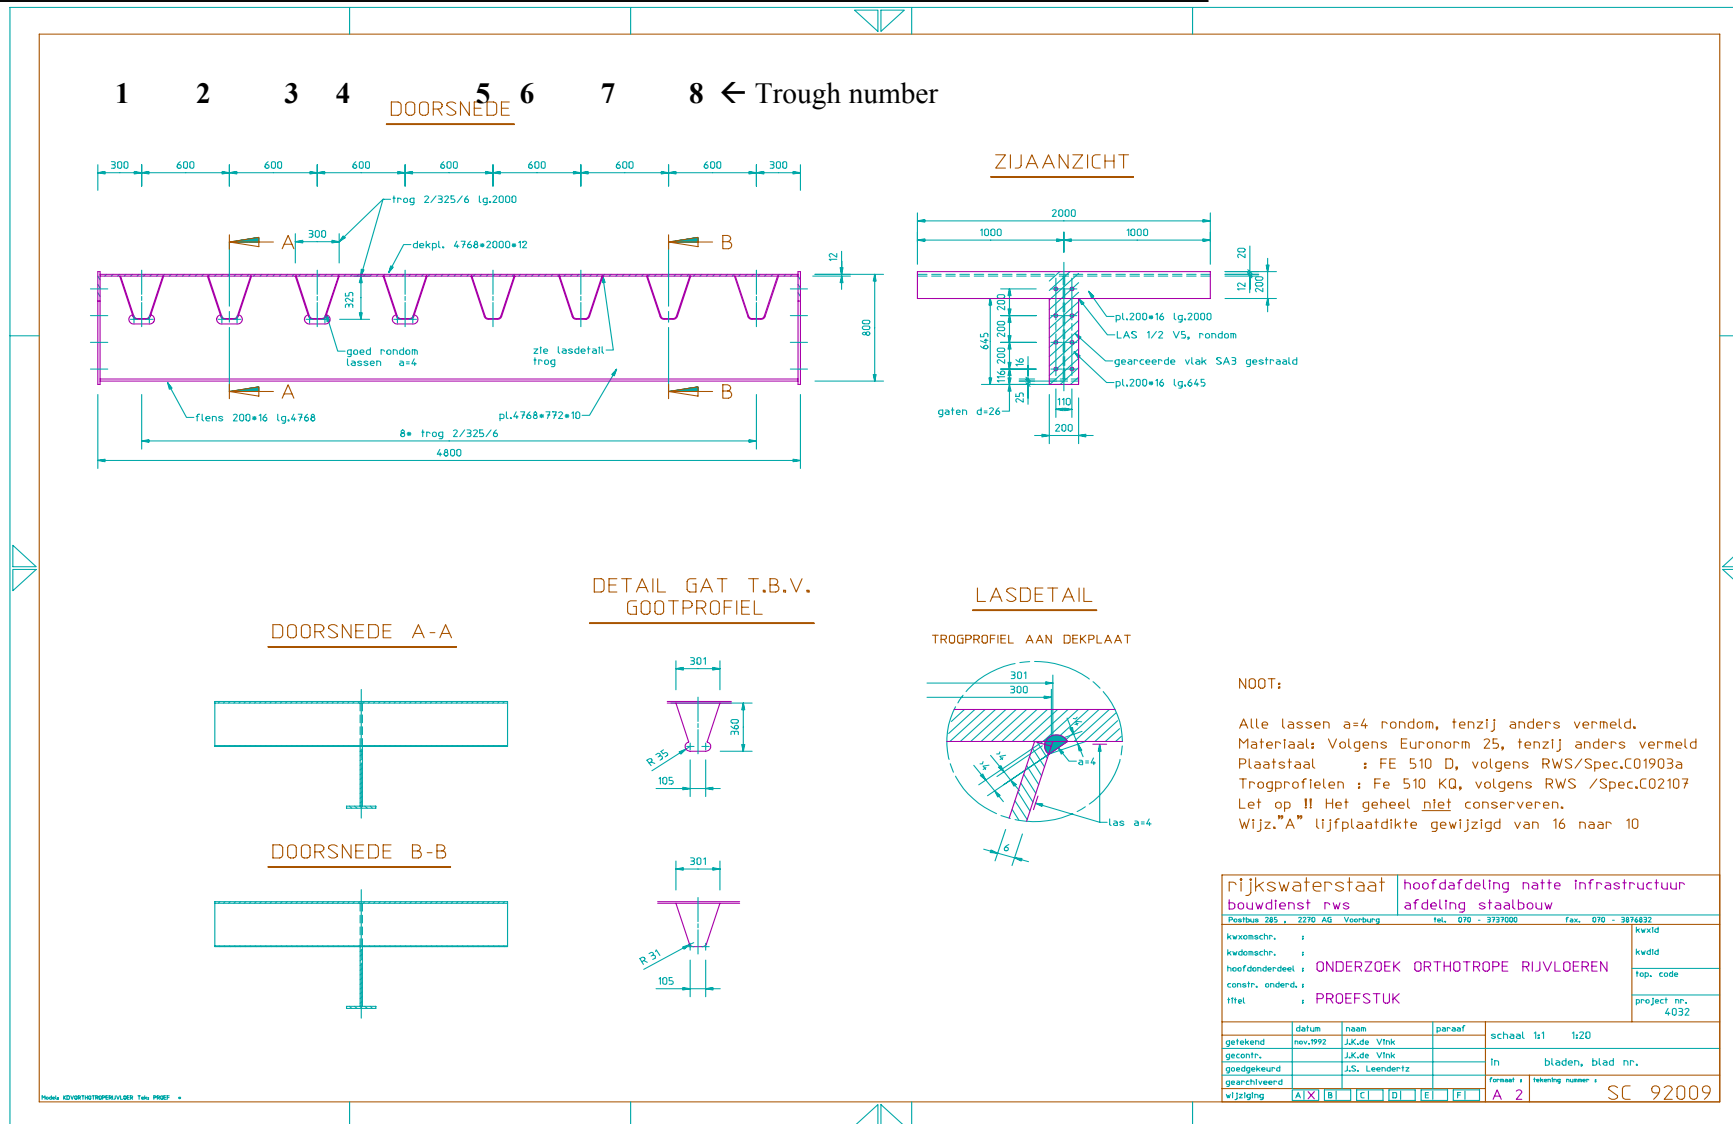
Drawing of the full-scale test specimen (text in Dutch)
